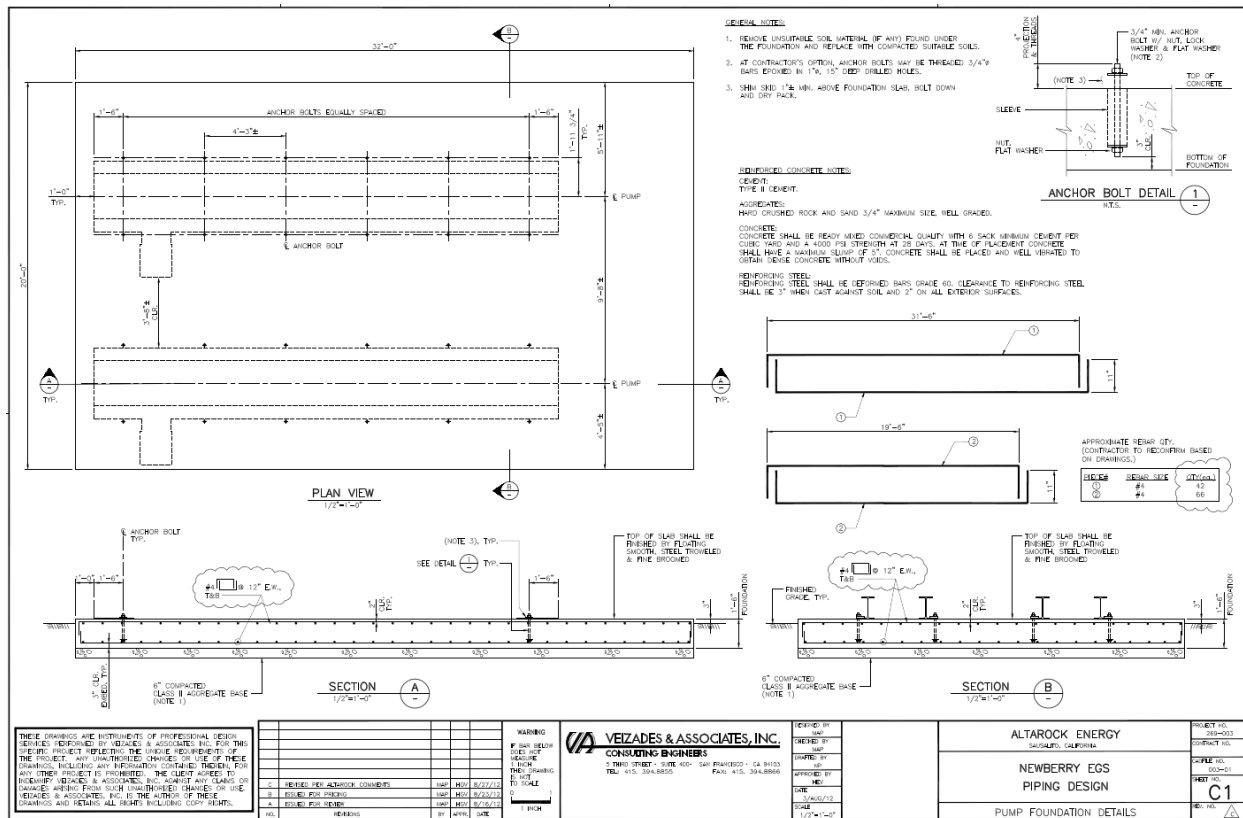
Pad S-29 stimulation pump concrete pad design.
